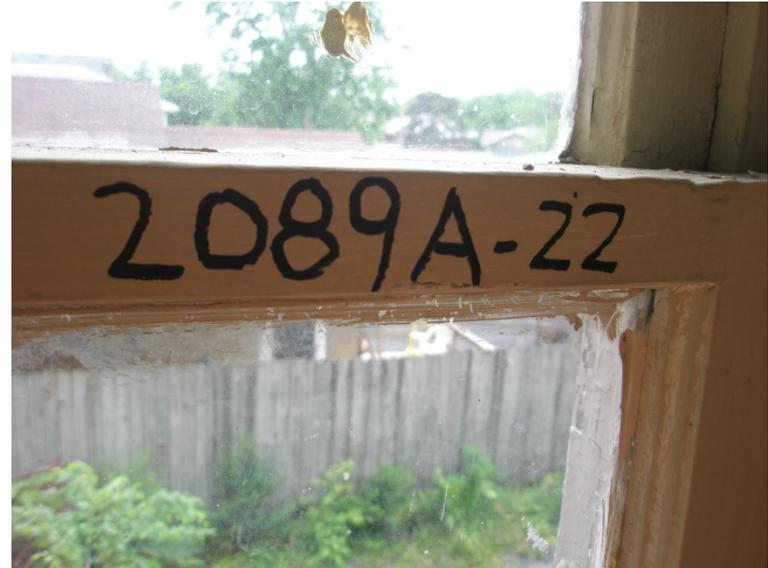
Window Glazing (2089A-22) Sun Room. No Asbestos Detected.
